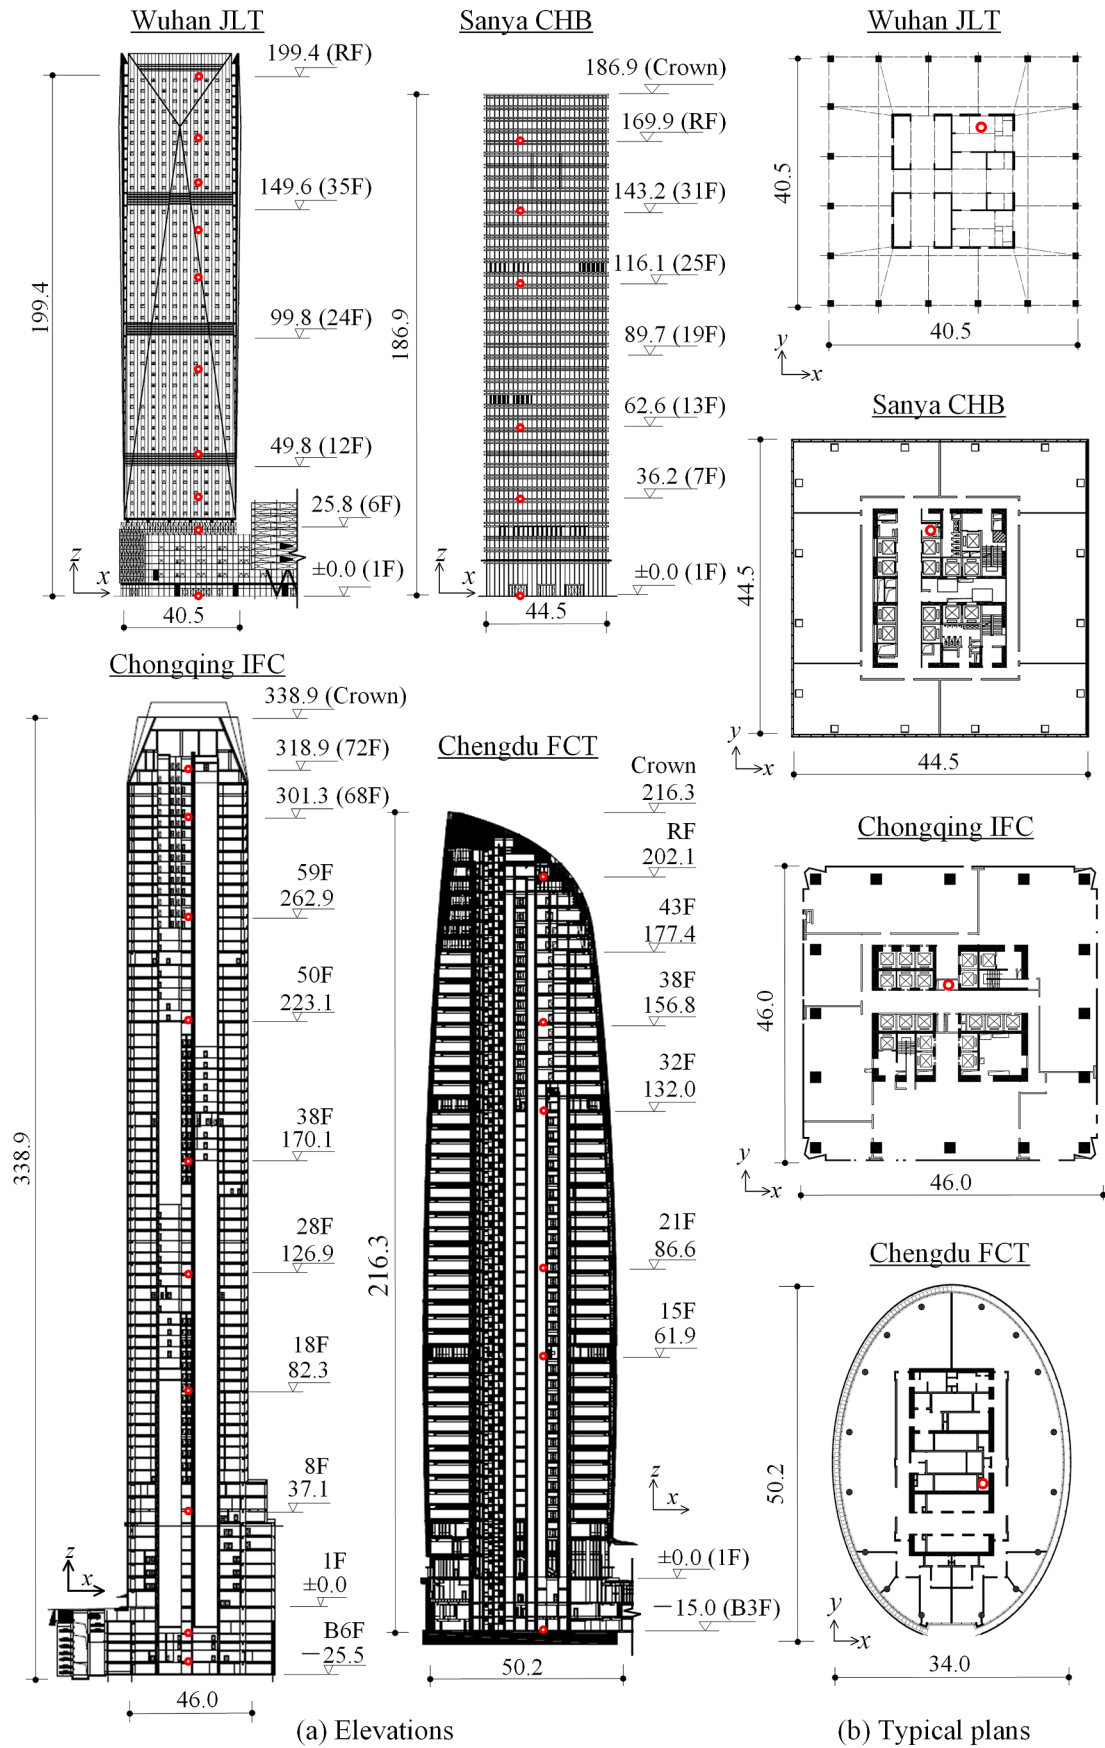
Location of sensors in (a) elevations, and (b) typical floor plans of buildings (unit: m).
